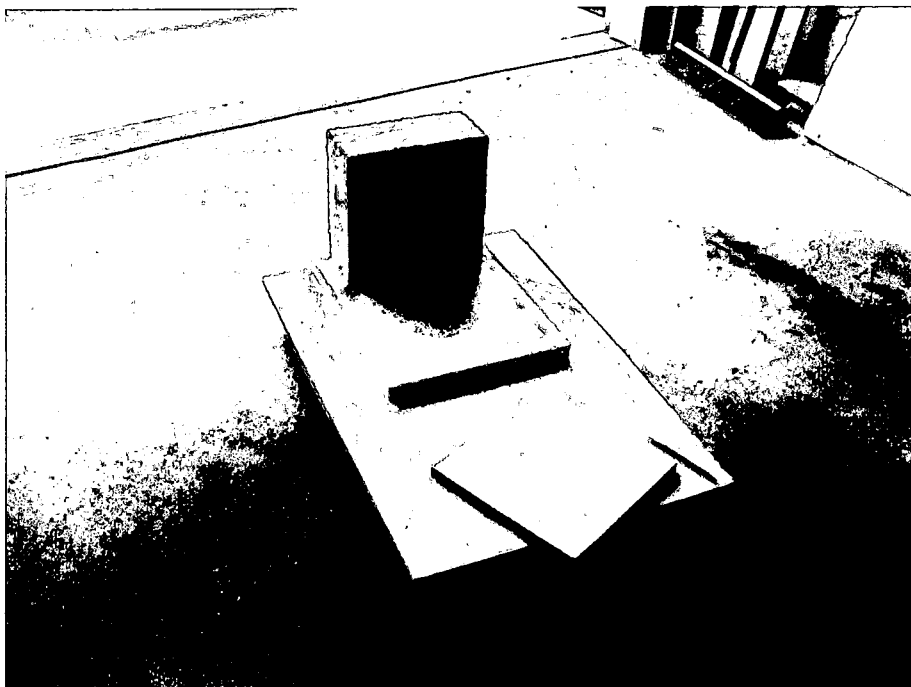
1-foot square, 5-1/2-inch thick wall section on test platform.
